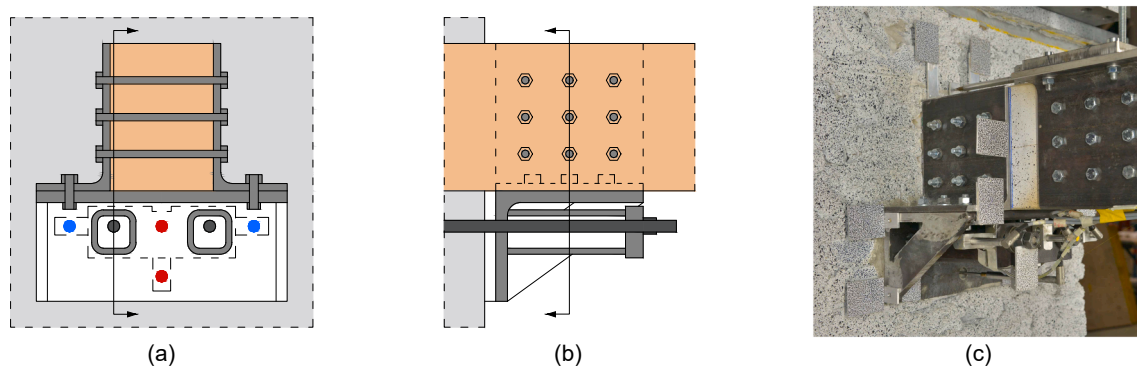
Shoe system adopted for PAT specimens: (a) front view; (b) section; (c) photo.
